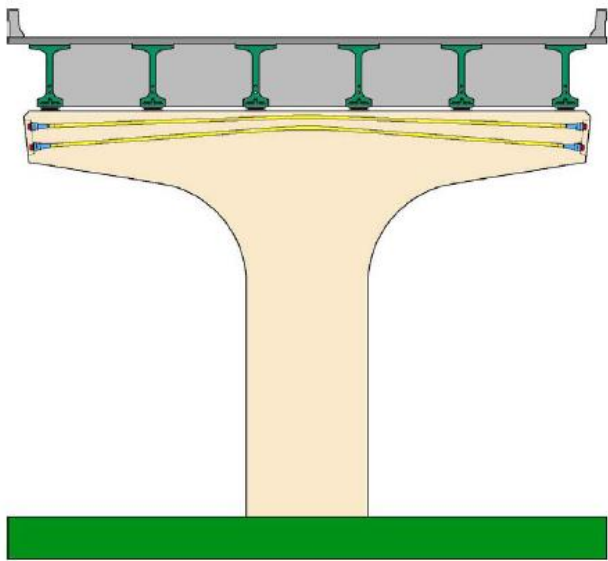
Post-Tensioning in Hammerhead Piers.
